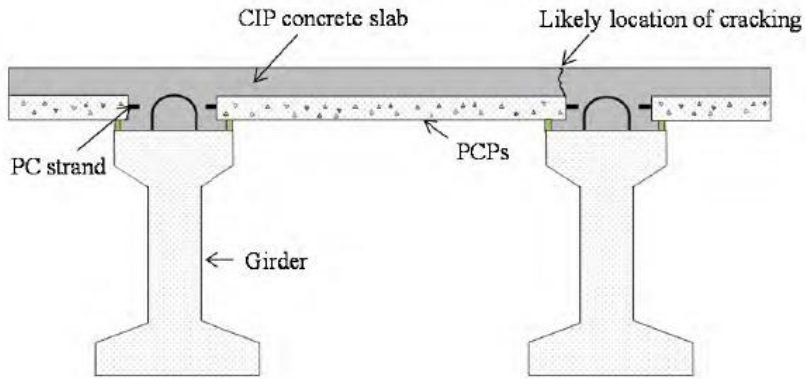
CIP-PCP bridge deck (section view) (Bayrak et al. 2013)
